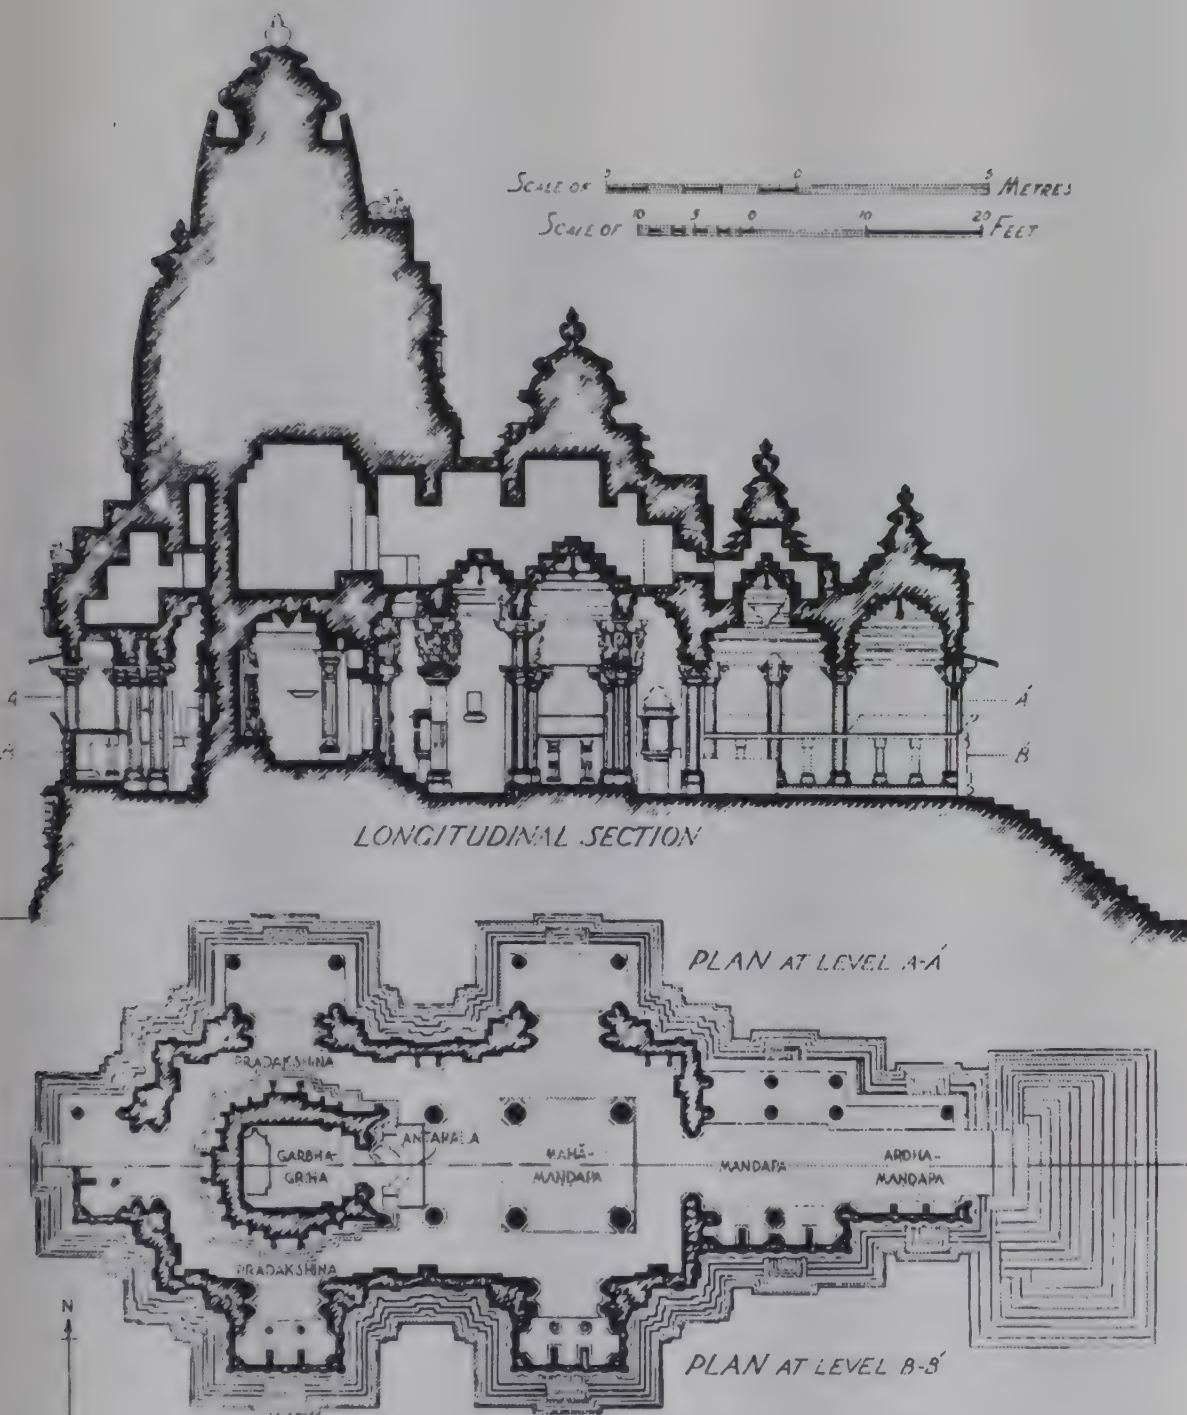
Khajuraho, Lakṣmaṇa temple, section and plan.
